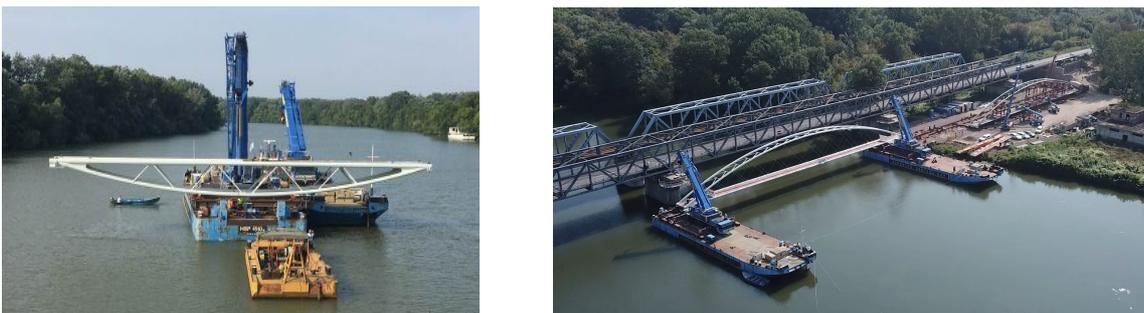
Shipping of the bridge elements of the Tisza River Bridge
